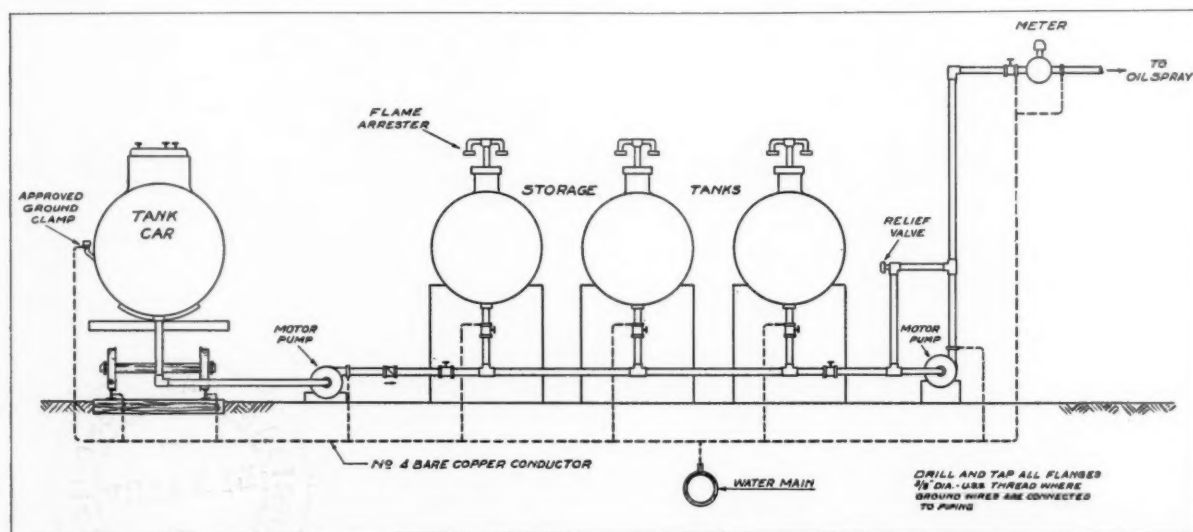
Grounding arrangement for unloading, storing, pumping and piping gasoline
